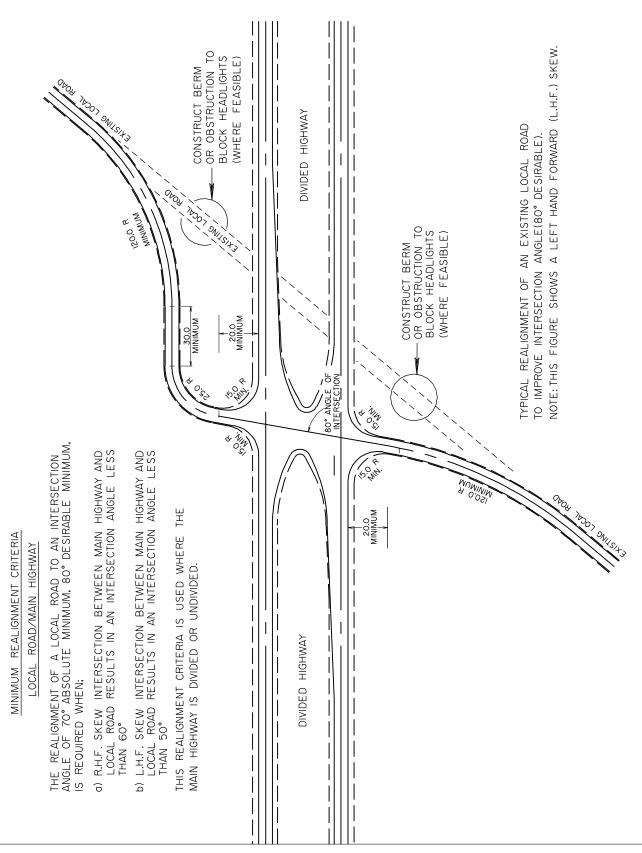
MINIMUM REALIGNMENT CRITERIA/TYPICAL LAYOUT AT JUNCTION OF MAJOR HIGHWAY AND LOCAL ROAD
